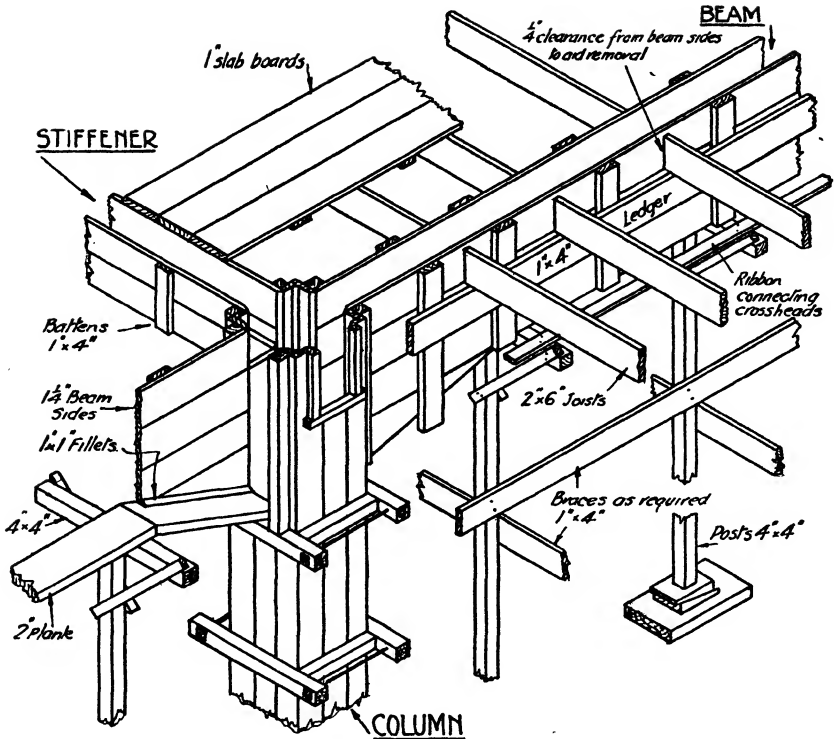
TYPICAL DETAIL OF SHUTTERING.
